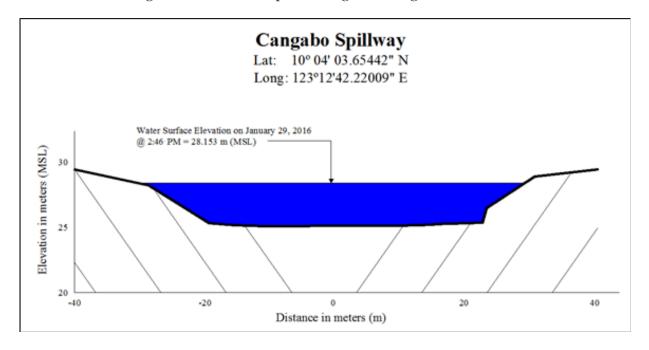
Deployment site, Cangabo Spillway, cross-section diagram
